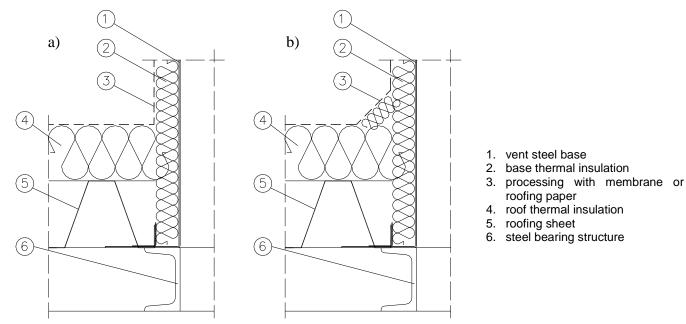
Steel base on steel structure (a - membrane flashing, b - roofing paper flashing)
